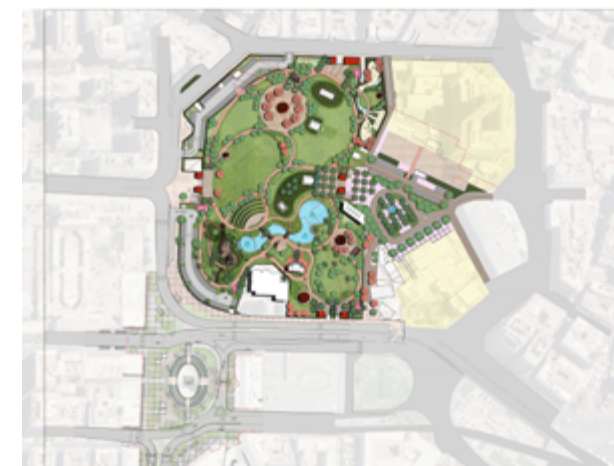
Master Plan of Azbakiya Park, illustrating the proposed layout and design interventions for the garden.
